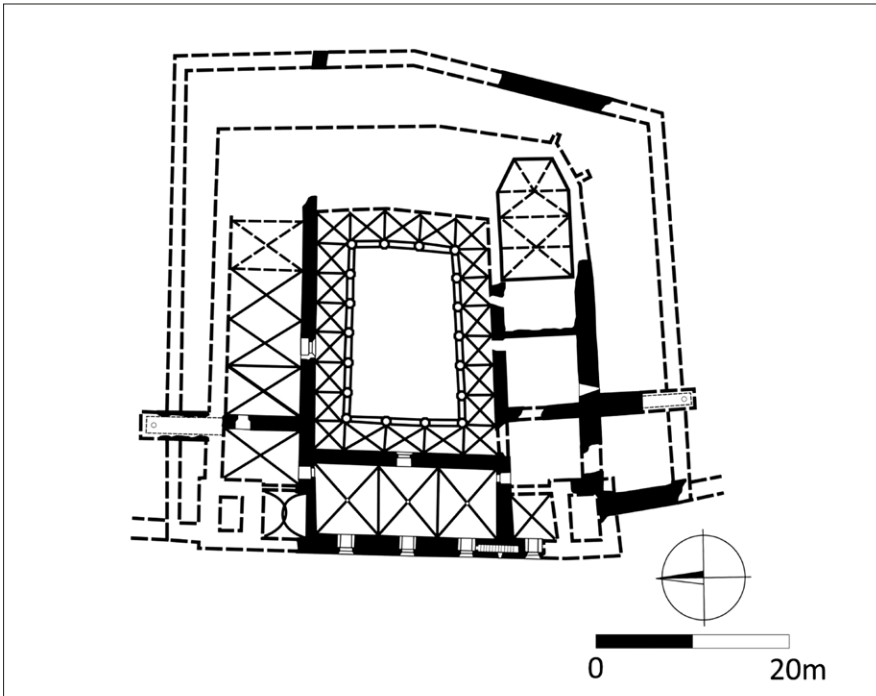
Plan of the castle in Písek (after T. Durdík, edited by the author).
